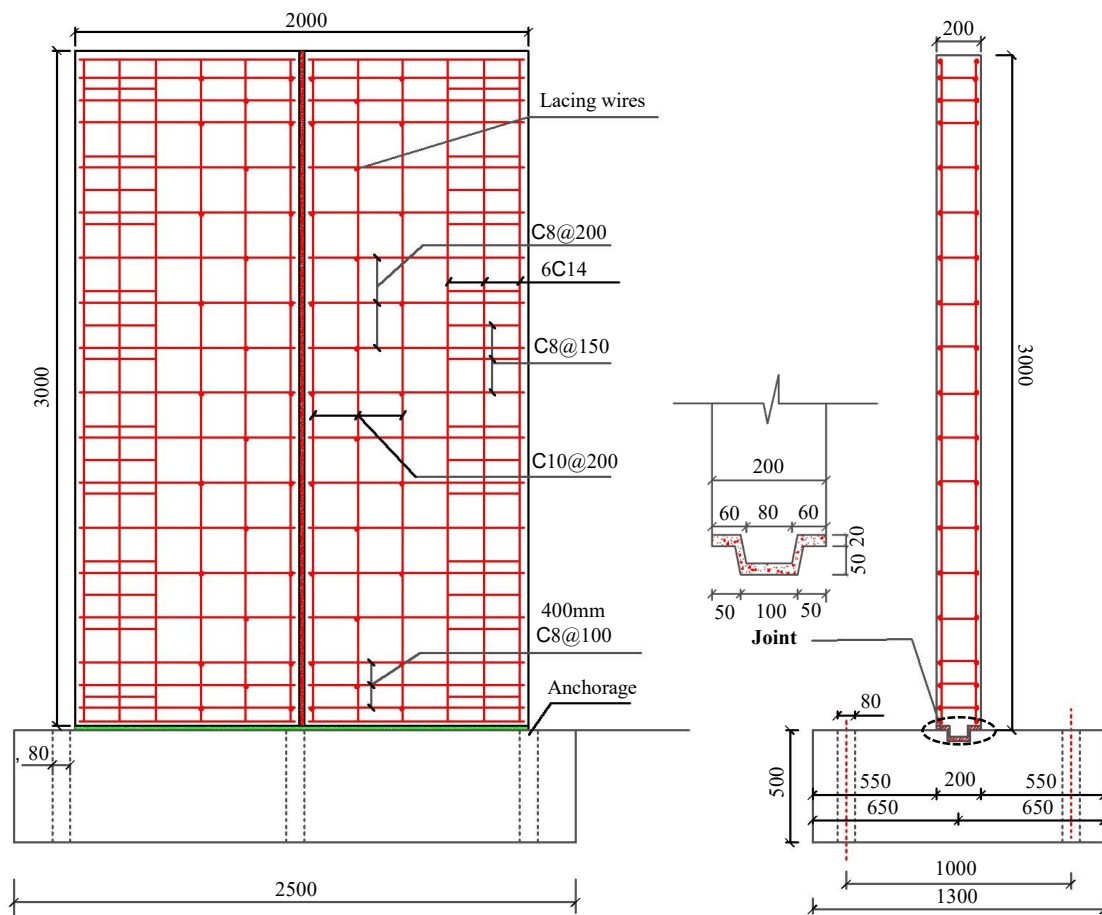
Geometric sizes and layout of reinforcing bars of PW2 (unit: mm).
